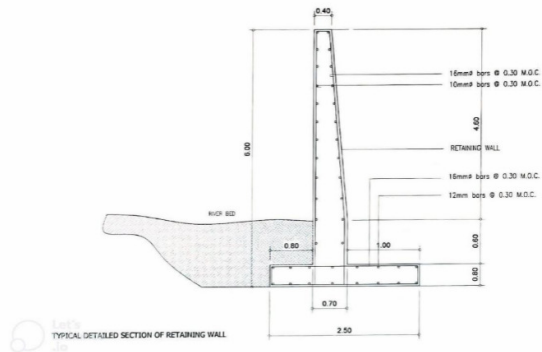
Typical Detailed Section of the Retaining Wall [17]
